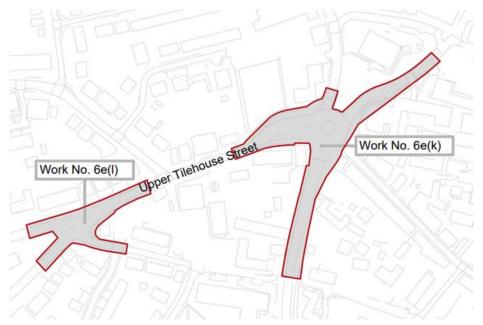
Copy of Works Plan No's 6e(l) and 6e(k) from Work Plans (Part 6 of 6) [APP-021 – page 21].
